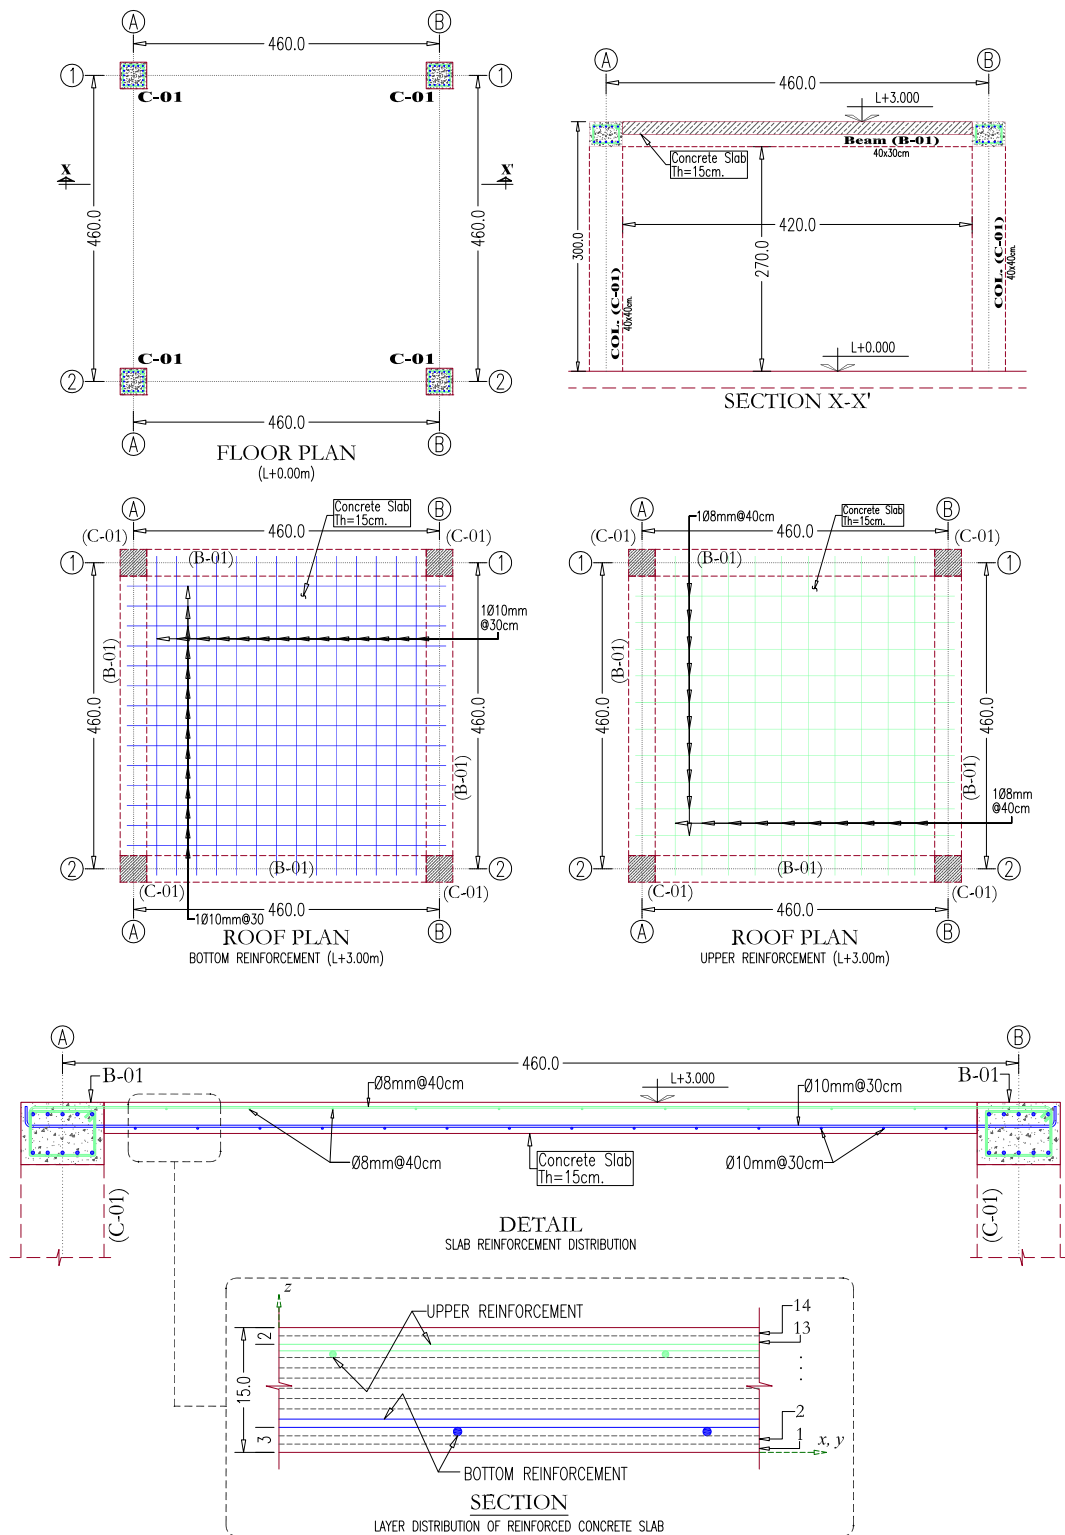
Structural drawings (plans and elevations) of a typical framing construction.
